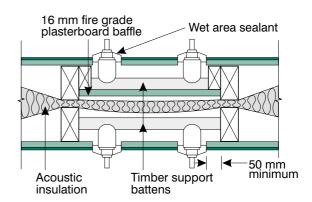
BAFFLE BETWEEN ELECTRICAL OUTLETS OR SWITCHES
